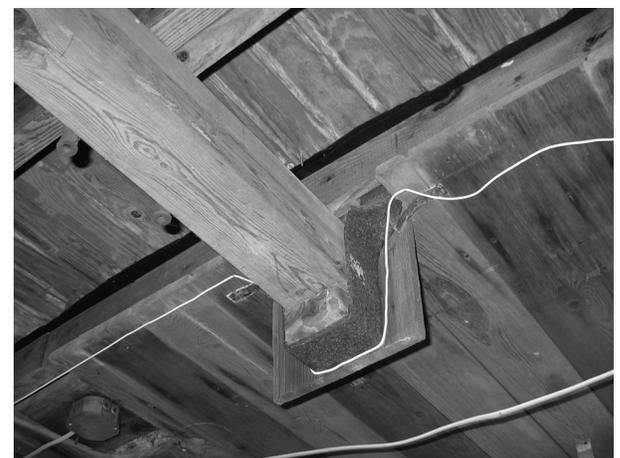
View of typical cast-iron U-shaped bracket used to hang beams for porch floor joists. (NPS-SERO0CR, 2003)
